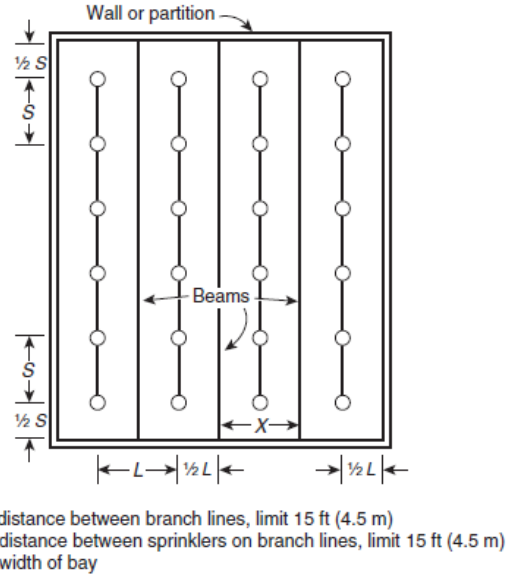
Positioning of Standard Spray Sprinklers Under Ceiling Consisting of Continuous Smooth Bays with Beams Supported on Columns in Ordinary Hazard Occupancy.
